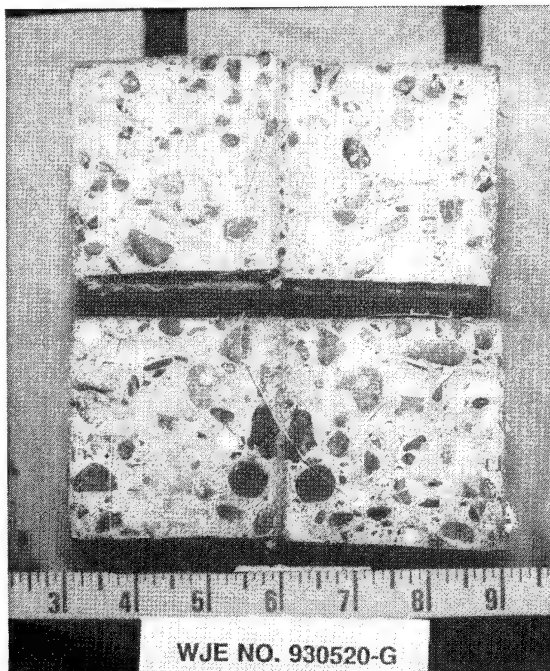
Photographs of bond strength test samples after fracture (Sheet 1 of 5)
